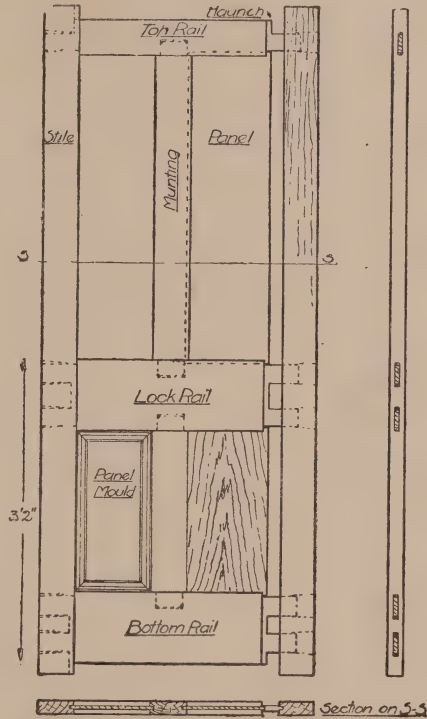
Front and Side Elevations and Horizontal Cross Section of Simple Panelled Door, showing method of fitting together
